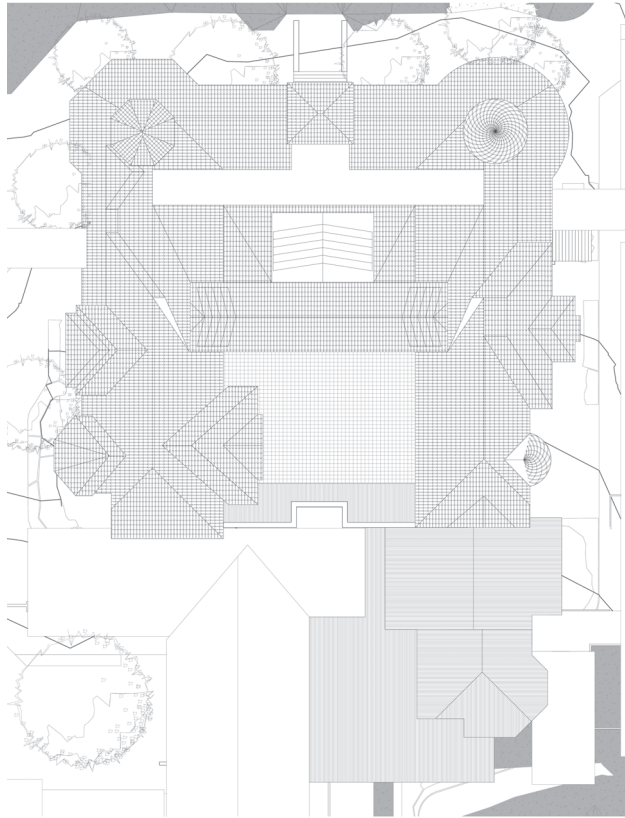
St John of God Richmond Hospital. Belmont House Existing Roof Plan. STH October 2021. Belmont House outlined in blue.
